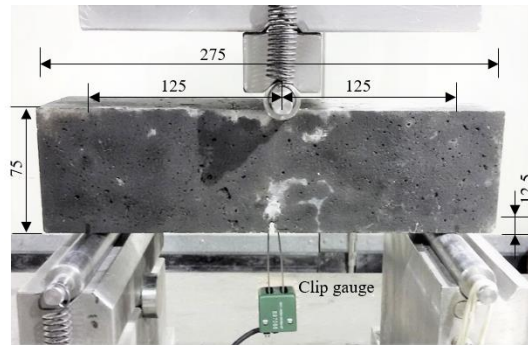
Three-point bending test set-up in 75 x 75 x 275 mm beam
